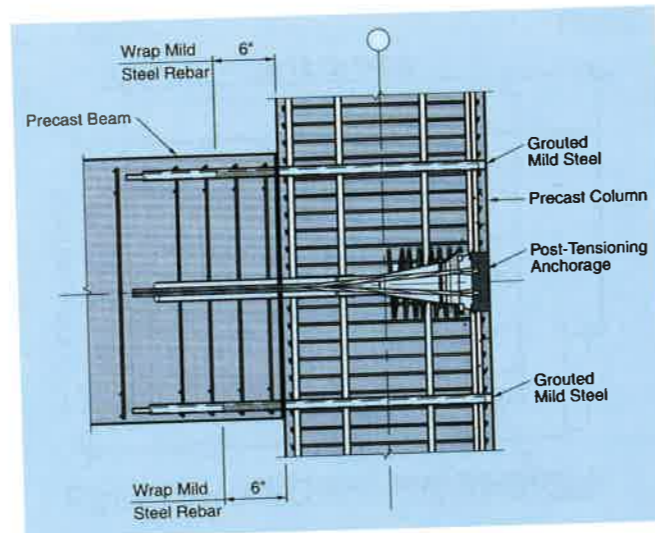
Detail of the Beam-Column Joint
